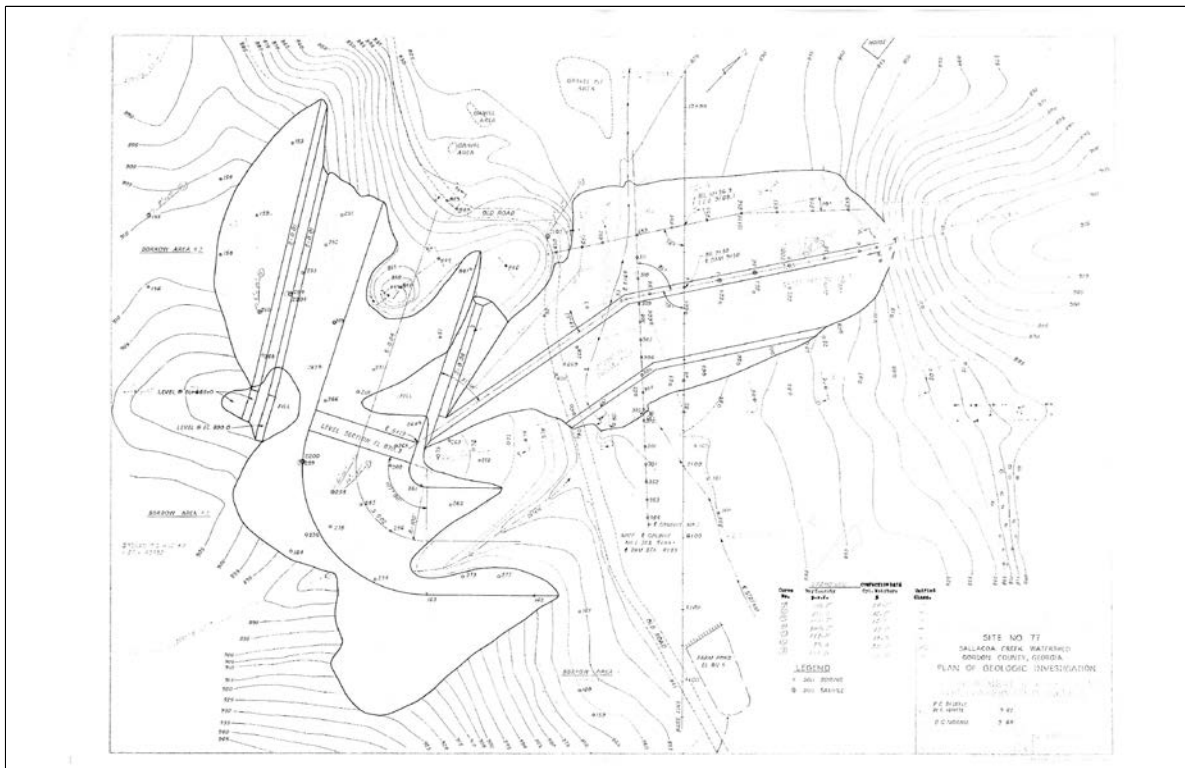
Plan view of Sallacoa No. 77 from 1968 geologic investigation drawings. Note the pre-existing sinkhole at the outlet end of the emergency spillway on the left abutment.
